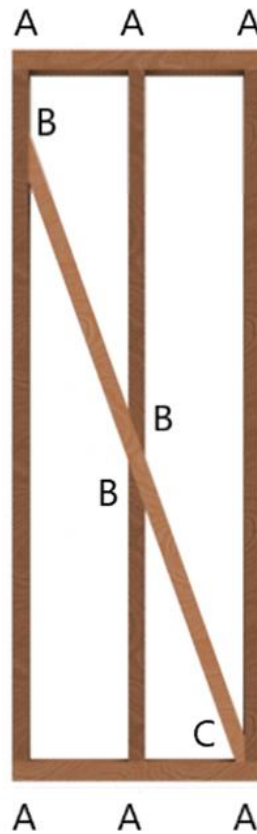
Joints location: A – Mortise and tenon joint, B – Notched joint, C – Connection by contact.
